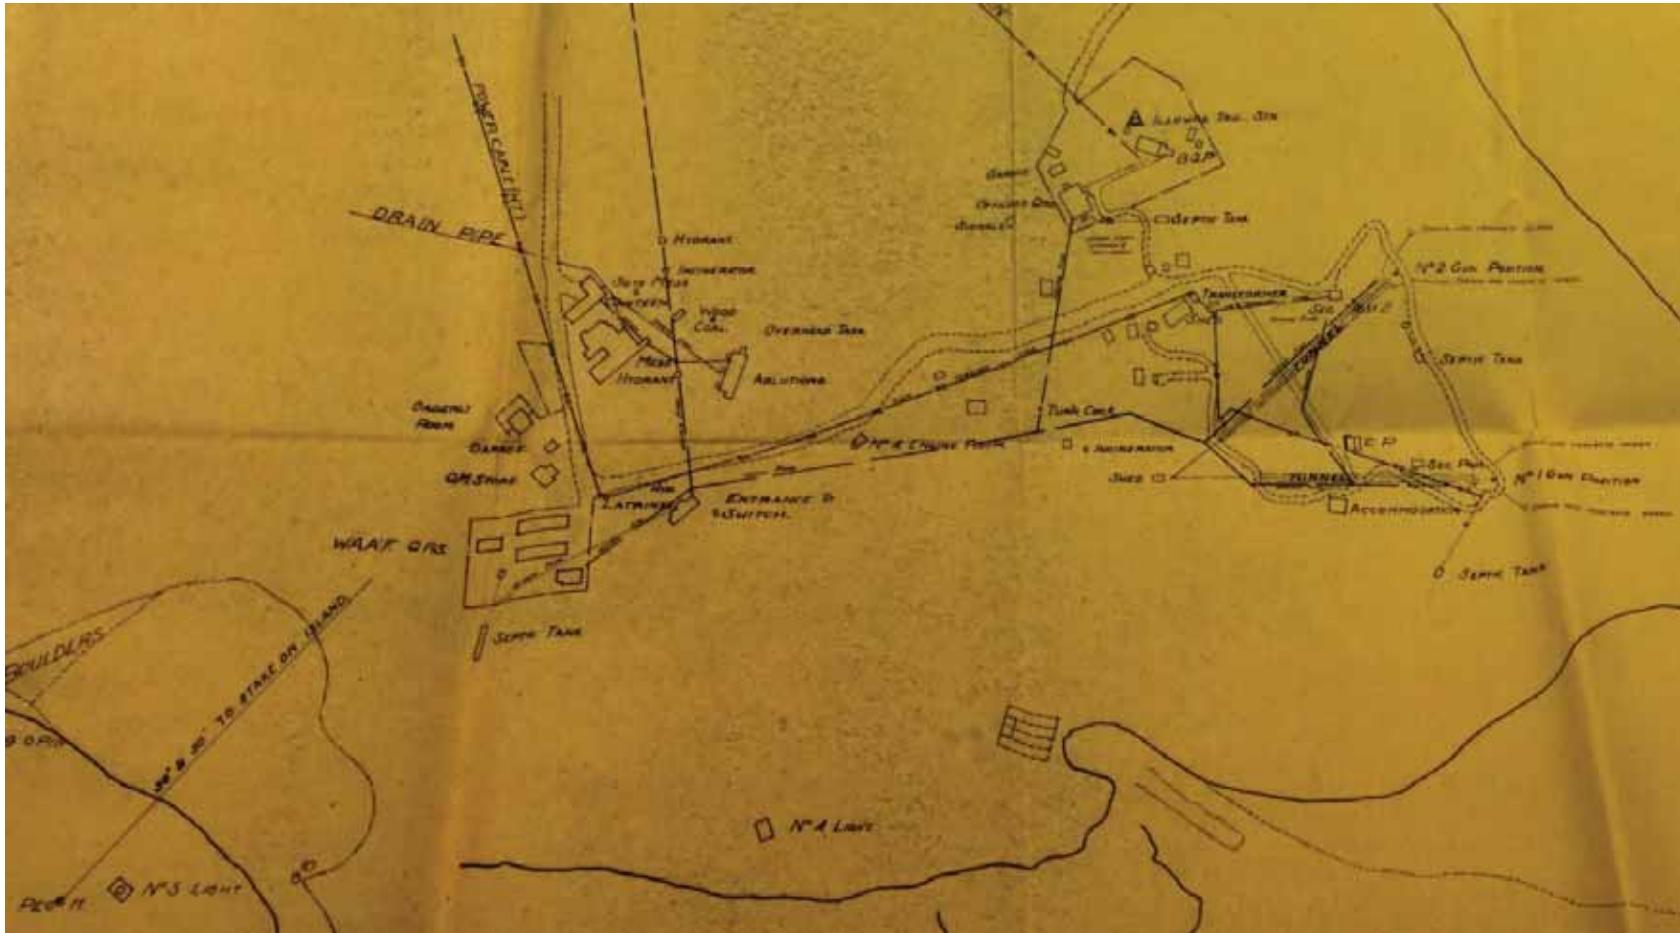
20 May 1944. Land acquisition, Port Kembla, Breakwater and Illowra Batteries, 1941-1948; PH/2135, Port Kembla Illowra Battery Layout of Site and Plan (Source: National Archives SP857/6).
